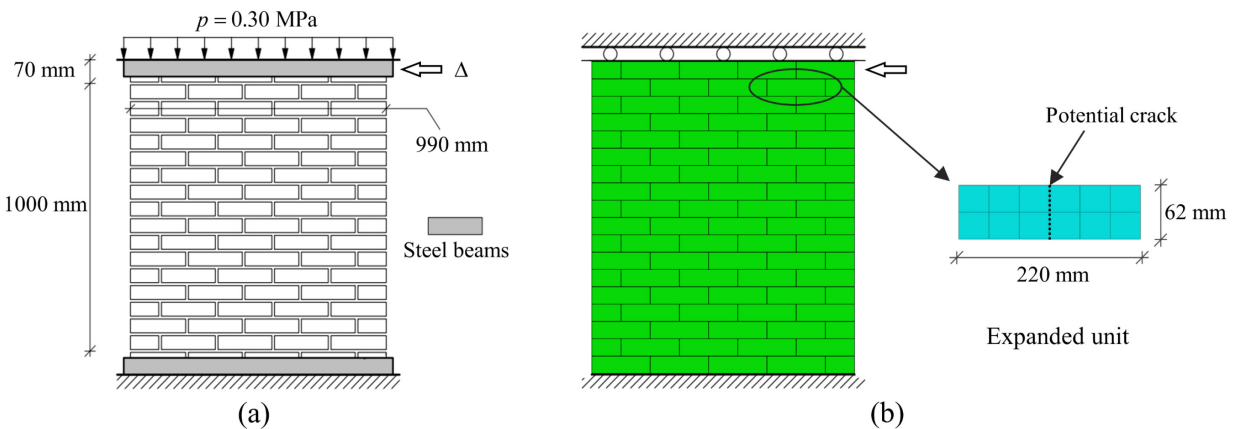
Masonry shear walls: (a) shear walls, and (b) SMM used for simulating the shear wall.
